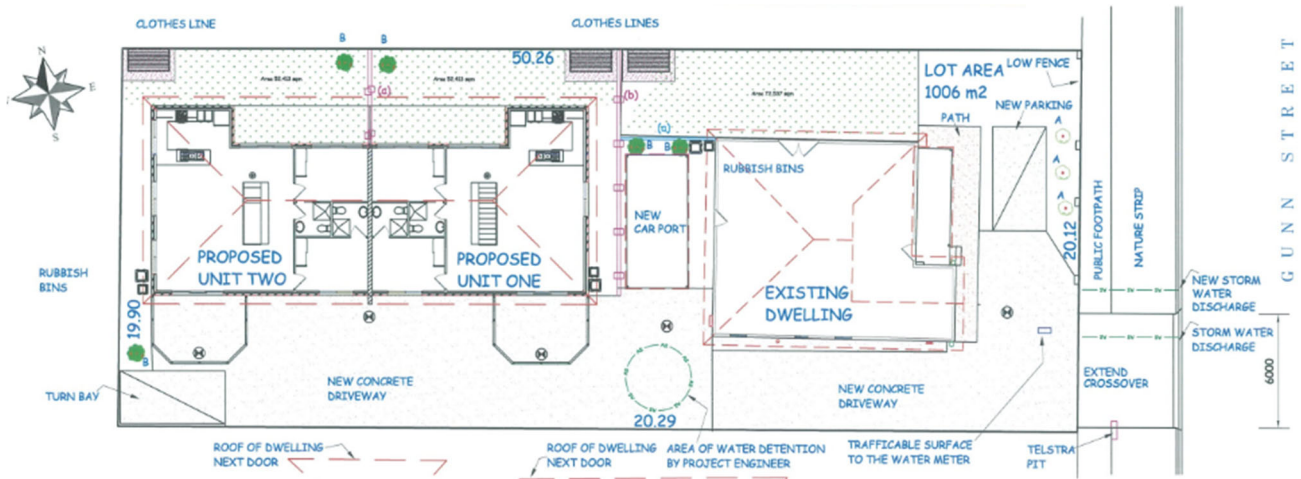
Site and landscaping plan, Weeda Drafting & Building Consultants, Project 12019
